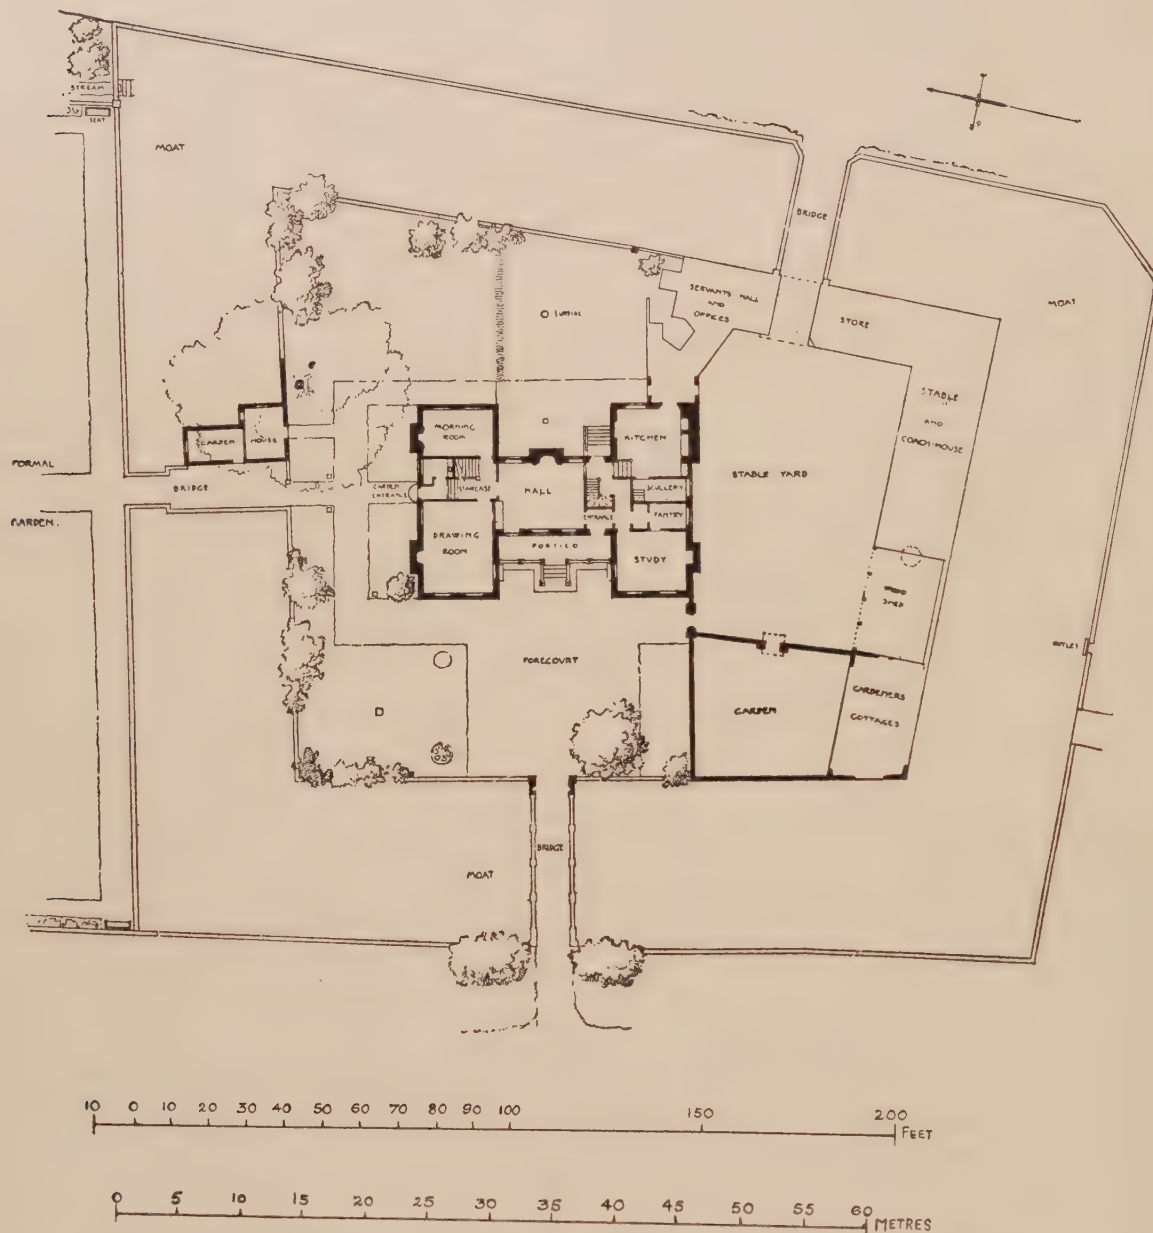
PLAN OF HOUSE AND SURROUNDINGS, GROOMBRIDGE PLACE, KENT.
